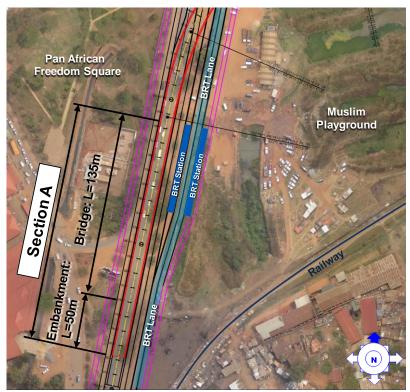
Section A showing the Straight section along Queensway Source: JICA Progress Report 2
